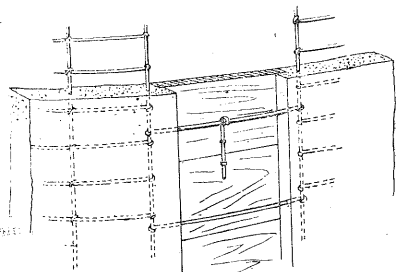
REINFORCEMENTS AROUND THE DOORWAY IN A CONCRETE SILO
